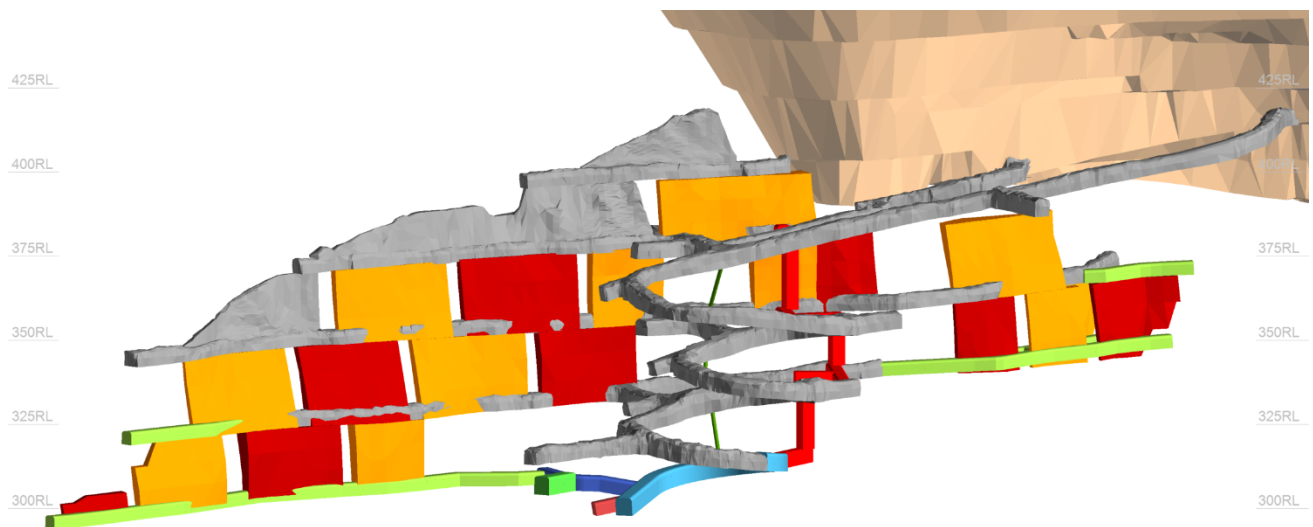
Golden Eagle underground layout showing existing pit and underground interfacing with the proposed stopes and development
